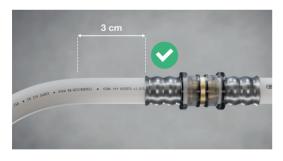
Bending of the pipe directly at the fitting is not allowed. A minimum distance of 3 cm must be observed.
